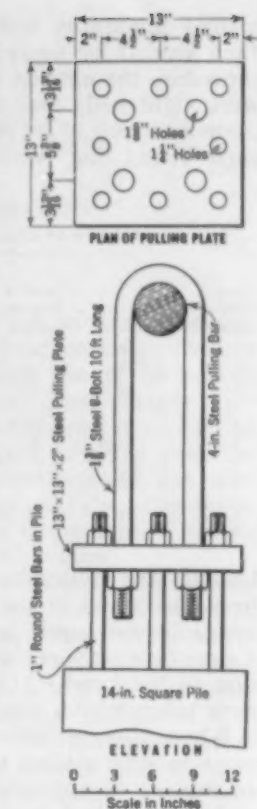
CROSS SECTION, SHOWING METHOD OF CONNECTING A PILE TO THE TESTING APPARATUS
